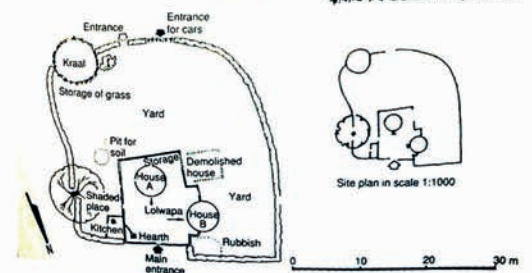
A typical plan of a dwelling unit belonging to one household (Silitshena & Mcleod, 1992: 239)
